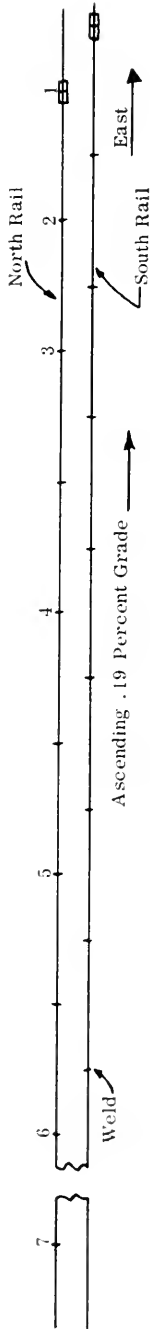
Test location for study of rail anchorage forces on continuous welded rail.
